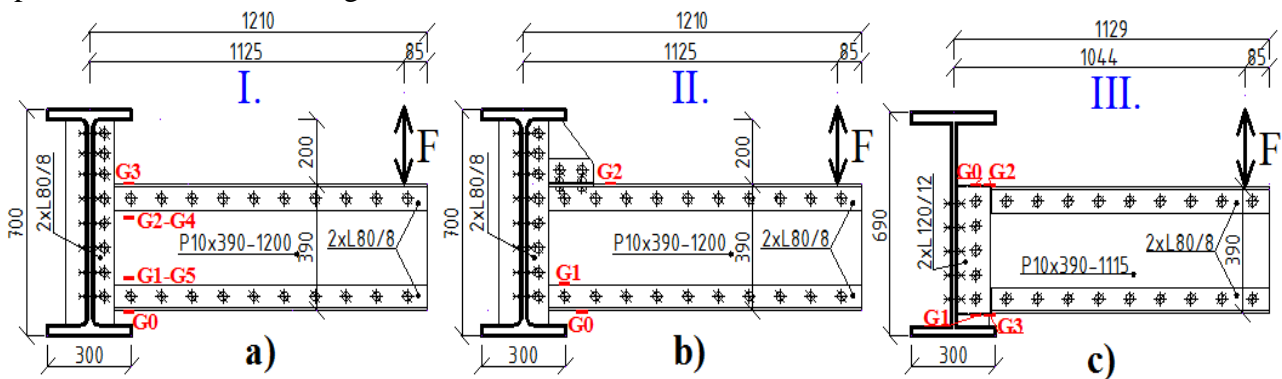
Configuration of a laboratory specimens without haunch (I), reinforced by haunch (II) and new specimens without haunch (III) and specimen gauge arrangement.
